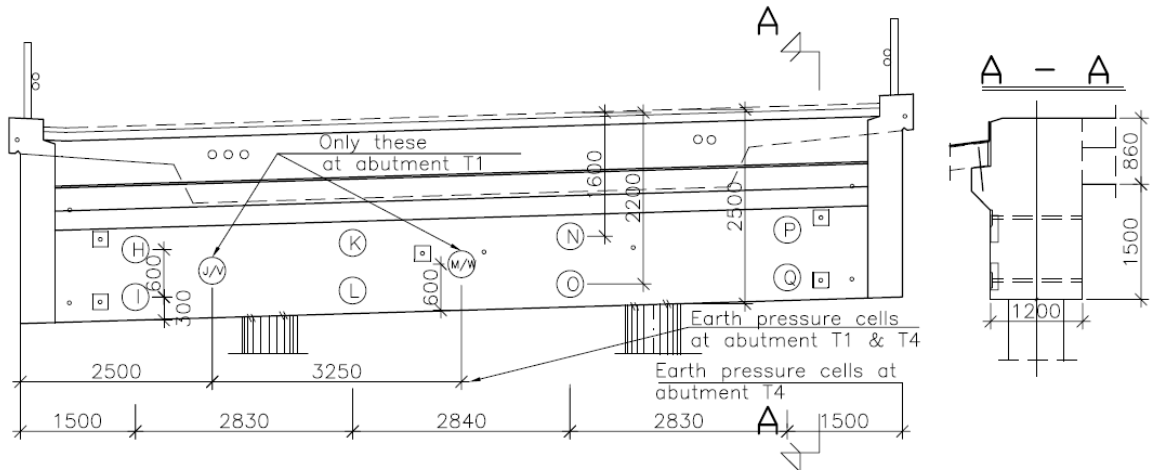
EPC locations at Haavistonjoki Bridge abutments. H to Q at abutment T4, V and W at abutment T1.
